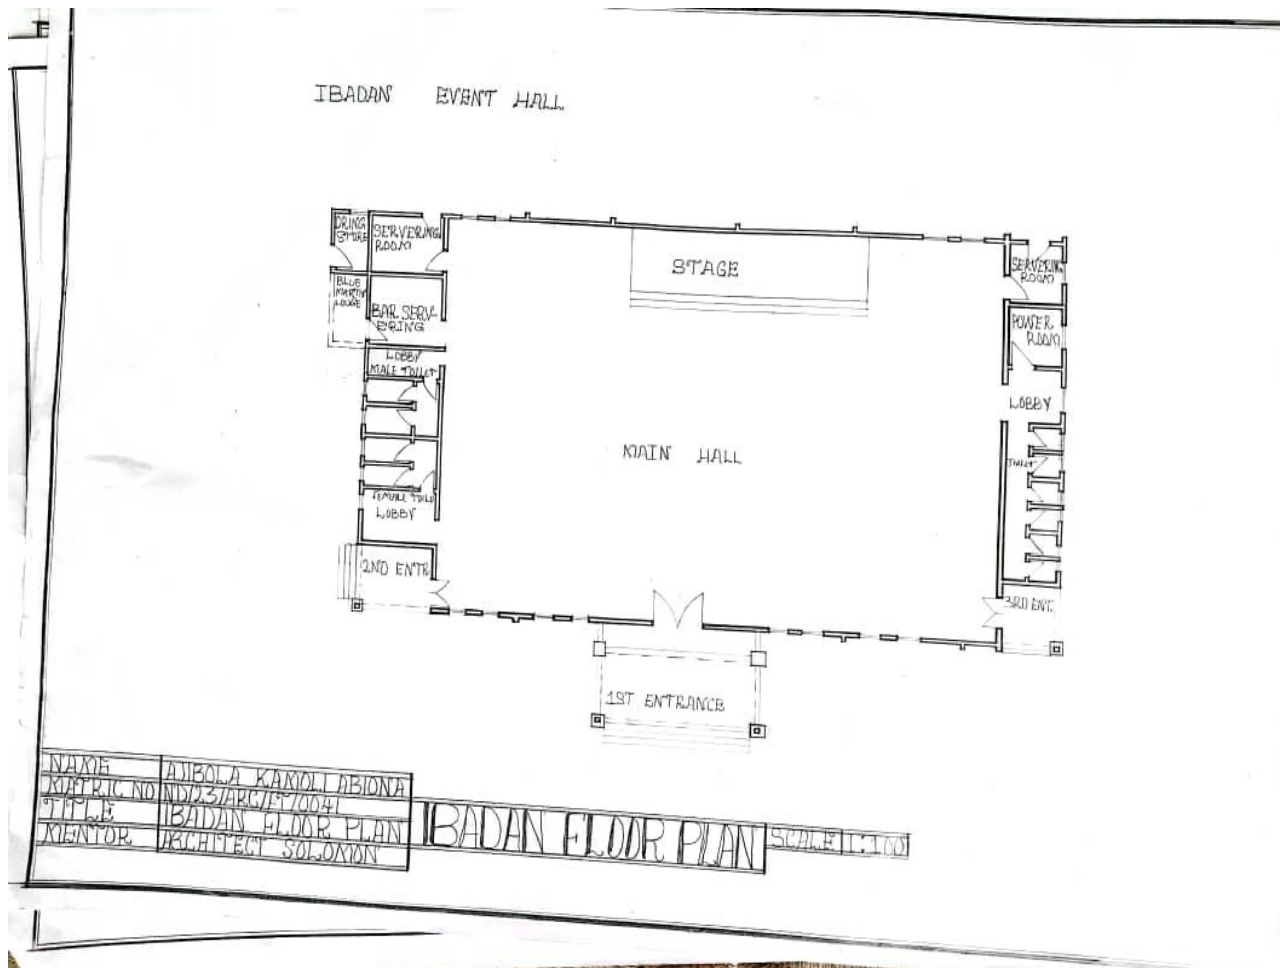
SHOWING THE FLOOR PLAN OF THE CASE STUDY TWO
